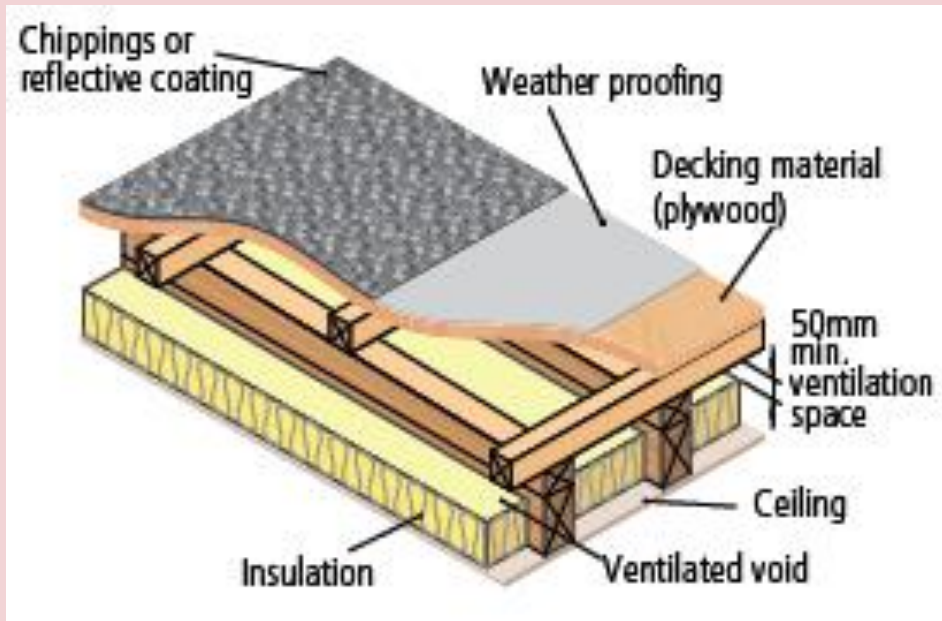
Lean-to roof details, showing battens, vent, felt and insulation for the horizontal space over ceiling.
